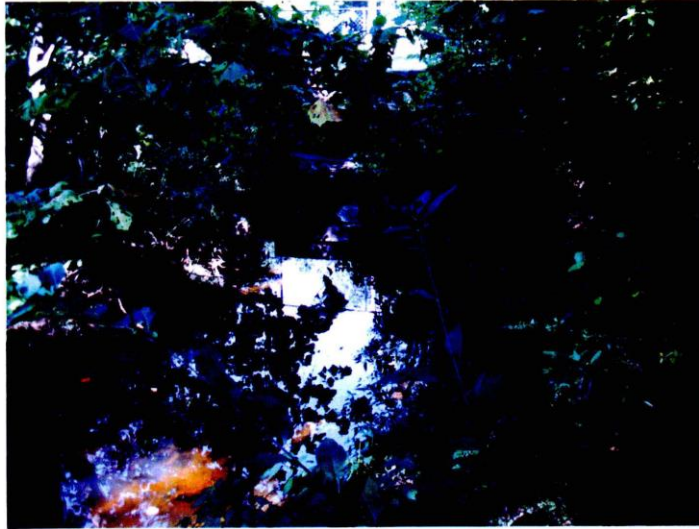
Looking upstream toward E Winchester Blvd box culvert
